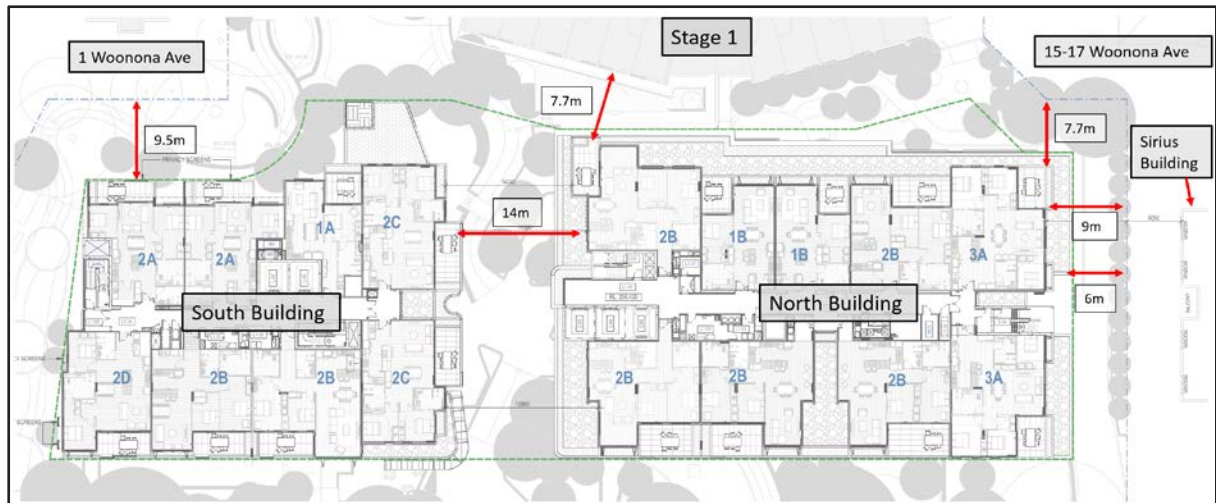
| Building Separation (Base Image Source: Applicants Architectural Plans)
